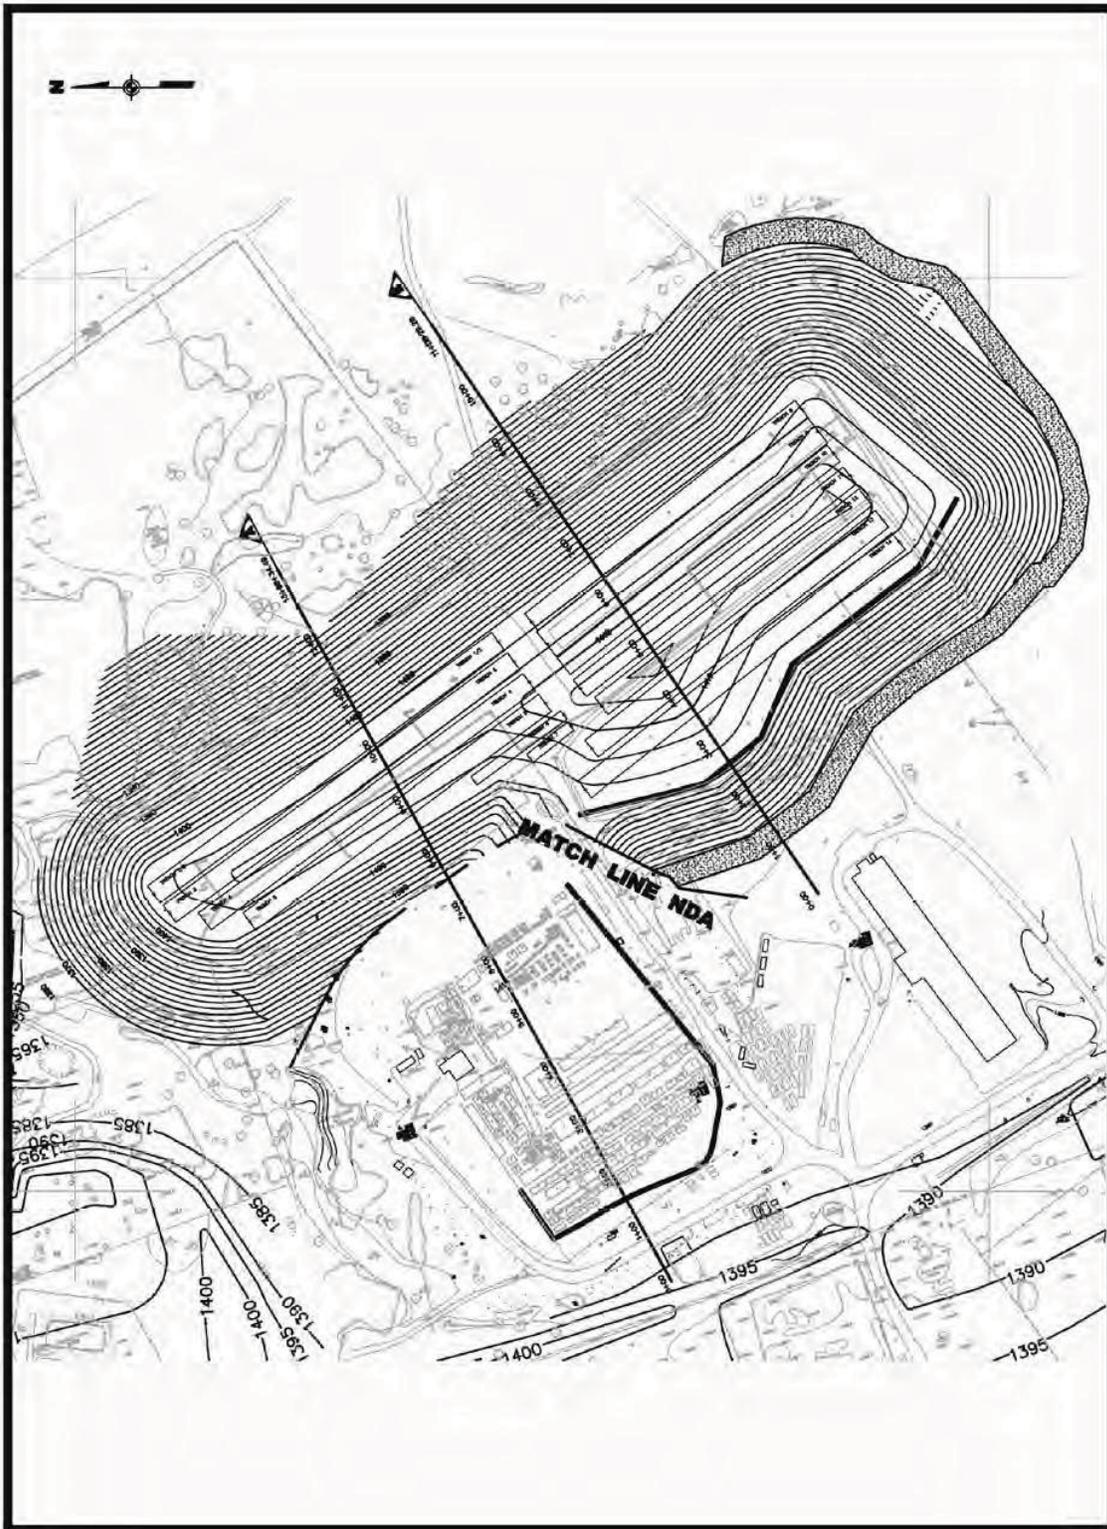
(Figure 2-30 from Sitewide report) WMA 8 Cap and Barrier Wall
